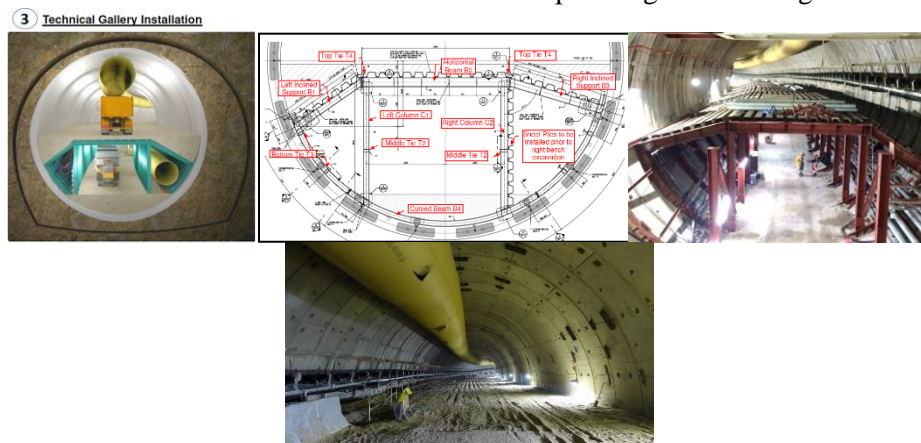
315m long temporary steel gallery installation and backfill on the deck
